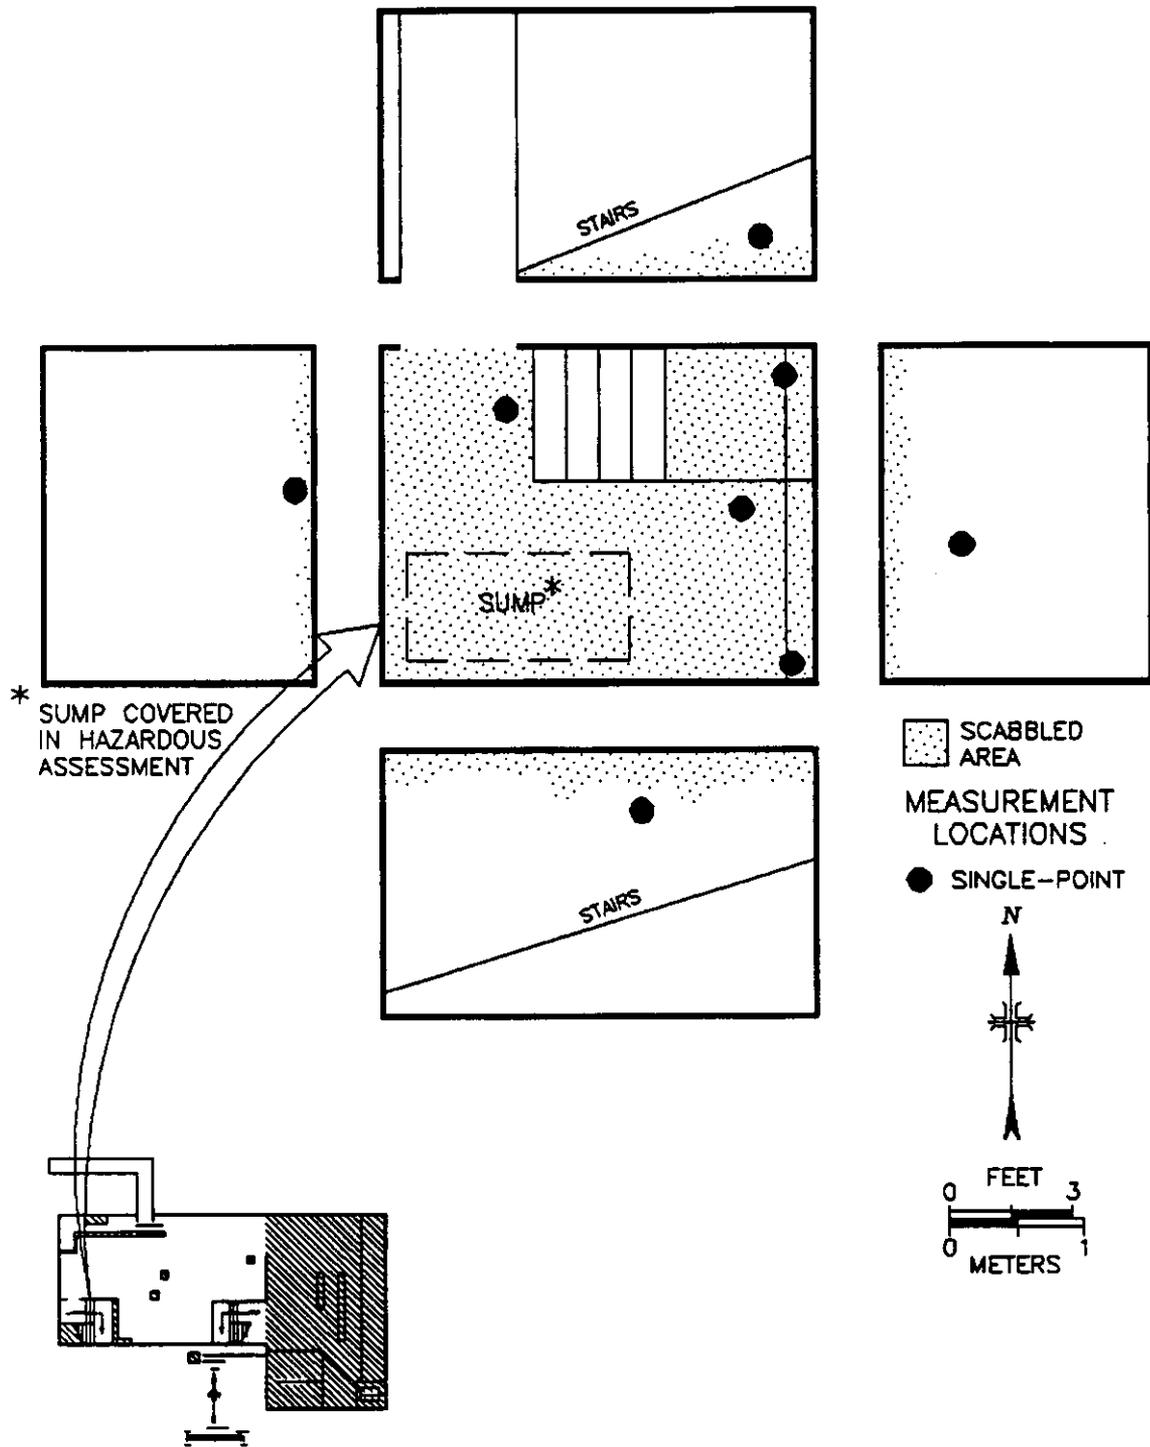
ARC Building 23, Basement, Southwest Stairwell Indicating Measurement Locations
